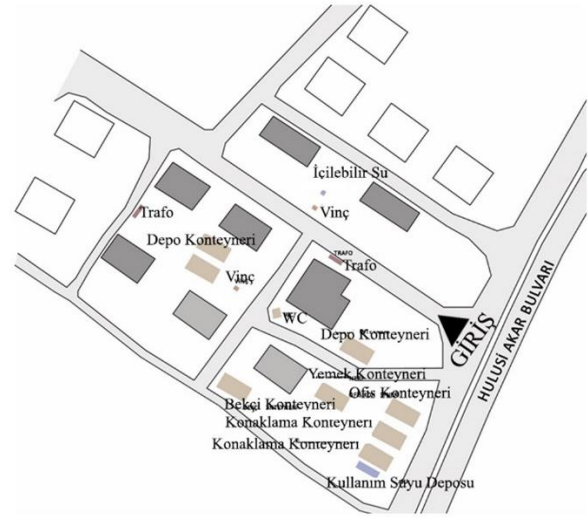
Current and proposed site layout plan of construction site 7 (Yolay, 2019)
